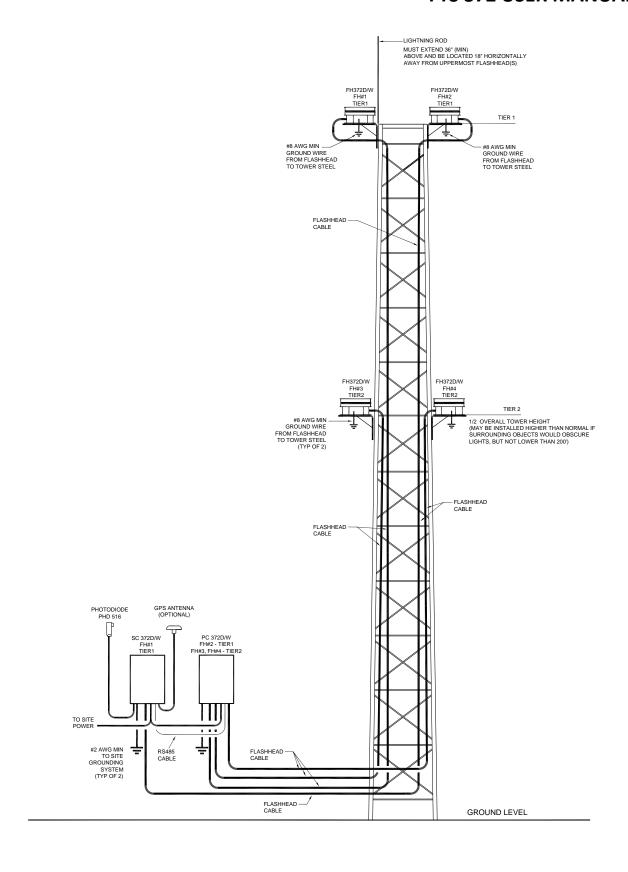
Typical E2+1 / D2+1 Avian Component Locations (AC 70/7460-1M)
